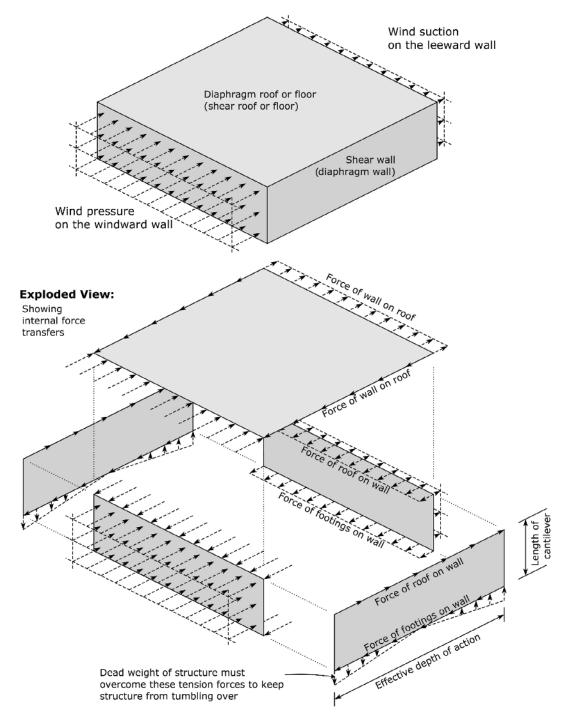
Forces on loaded wall, diaphragm roof, shear walls, and footings.
